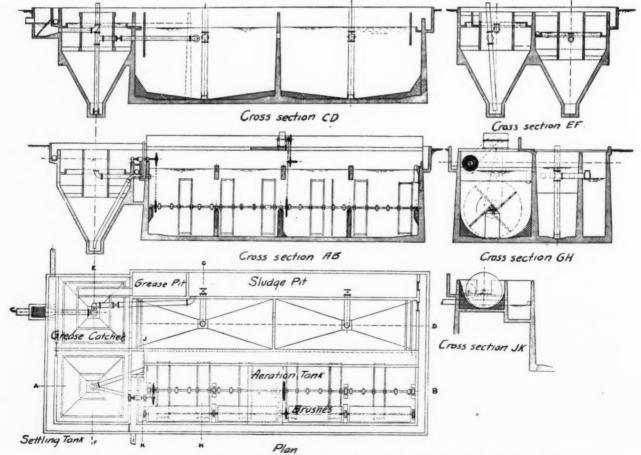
PLAN AND SECTIONS OF SLAUGHTERHOUSE WASTE TREATMENT PLANT AT APELDOORM
